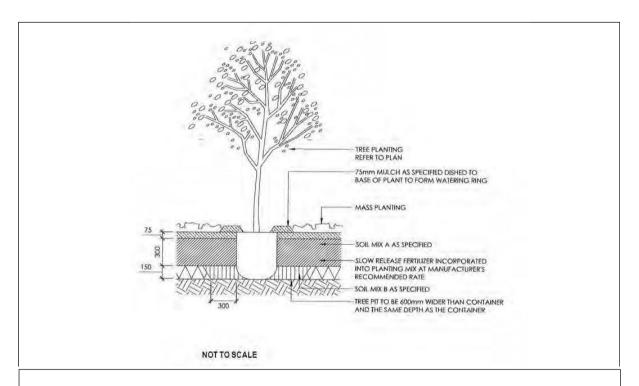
Semi-mature Tree in Tree in Mass Planting or Turf
